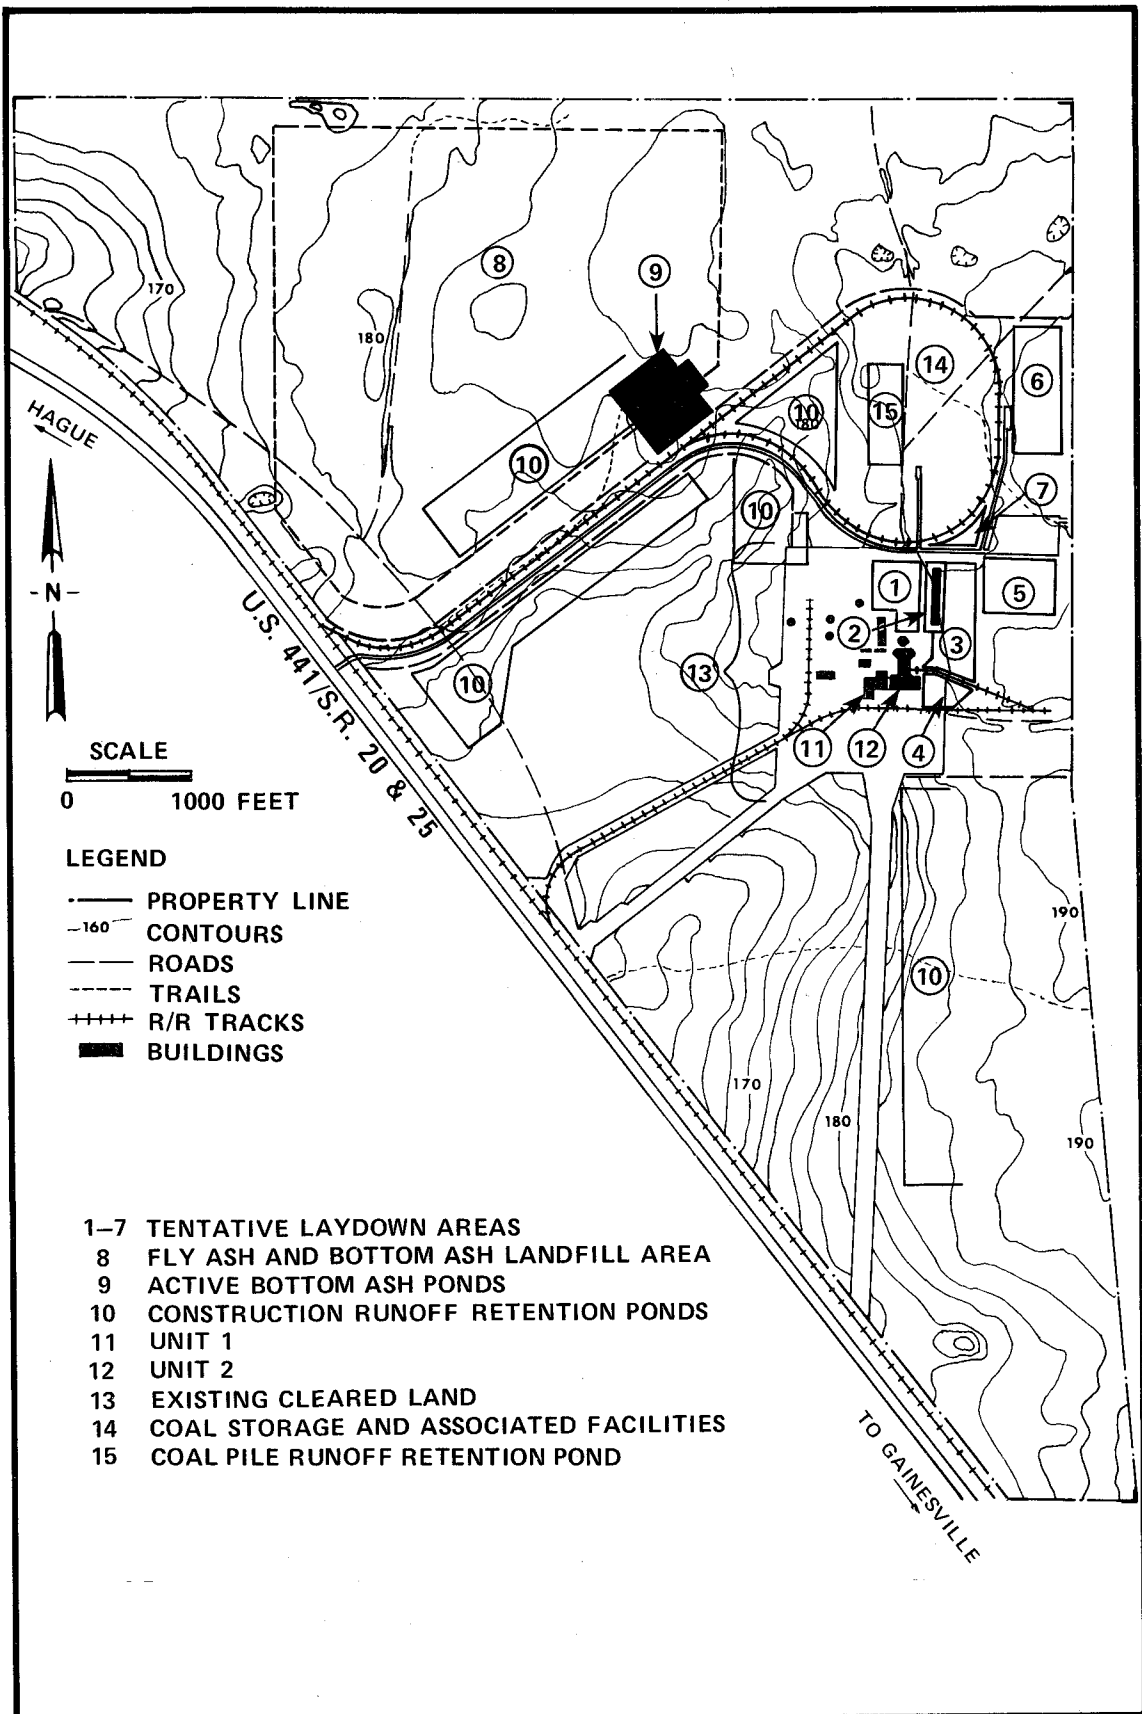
PROPOSED SITE PLAN OF THE DEERHAVEN SITE.
